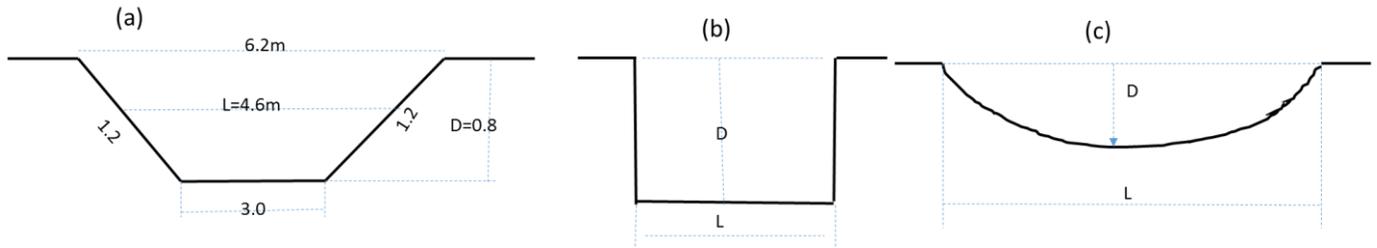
Common spillway forms used for check dams. (a) Trapezoidal spillway for loose stone, boulder, gabion and cement masonry check dams; (b) rectangular spillway for brushwood, log (pole), gabion and cement masonry check dams; (c) concave spillway for brushwood and loose stone check dams (Source:)
